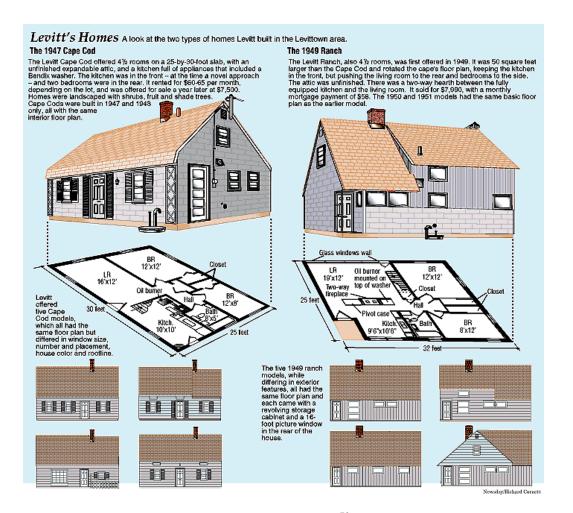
Elevation and plan of Levitt's houses.<sup>79</sup>
